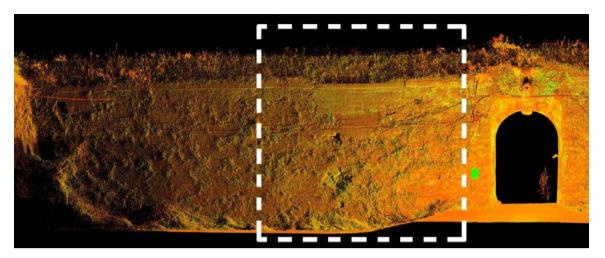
Scan of the face of the wall with a marked place of the slide (2017) – authors' own elaboration
